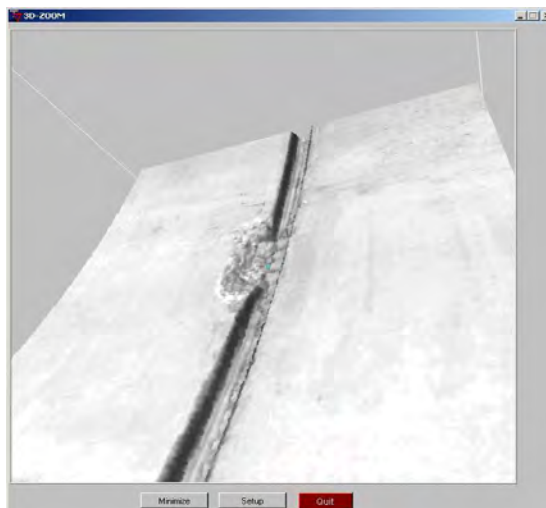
3D view of the concrete surface in a tunnel with damage (chip-off) near the joint of two sections.
